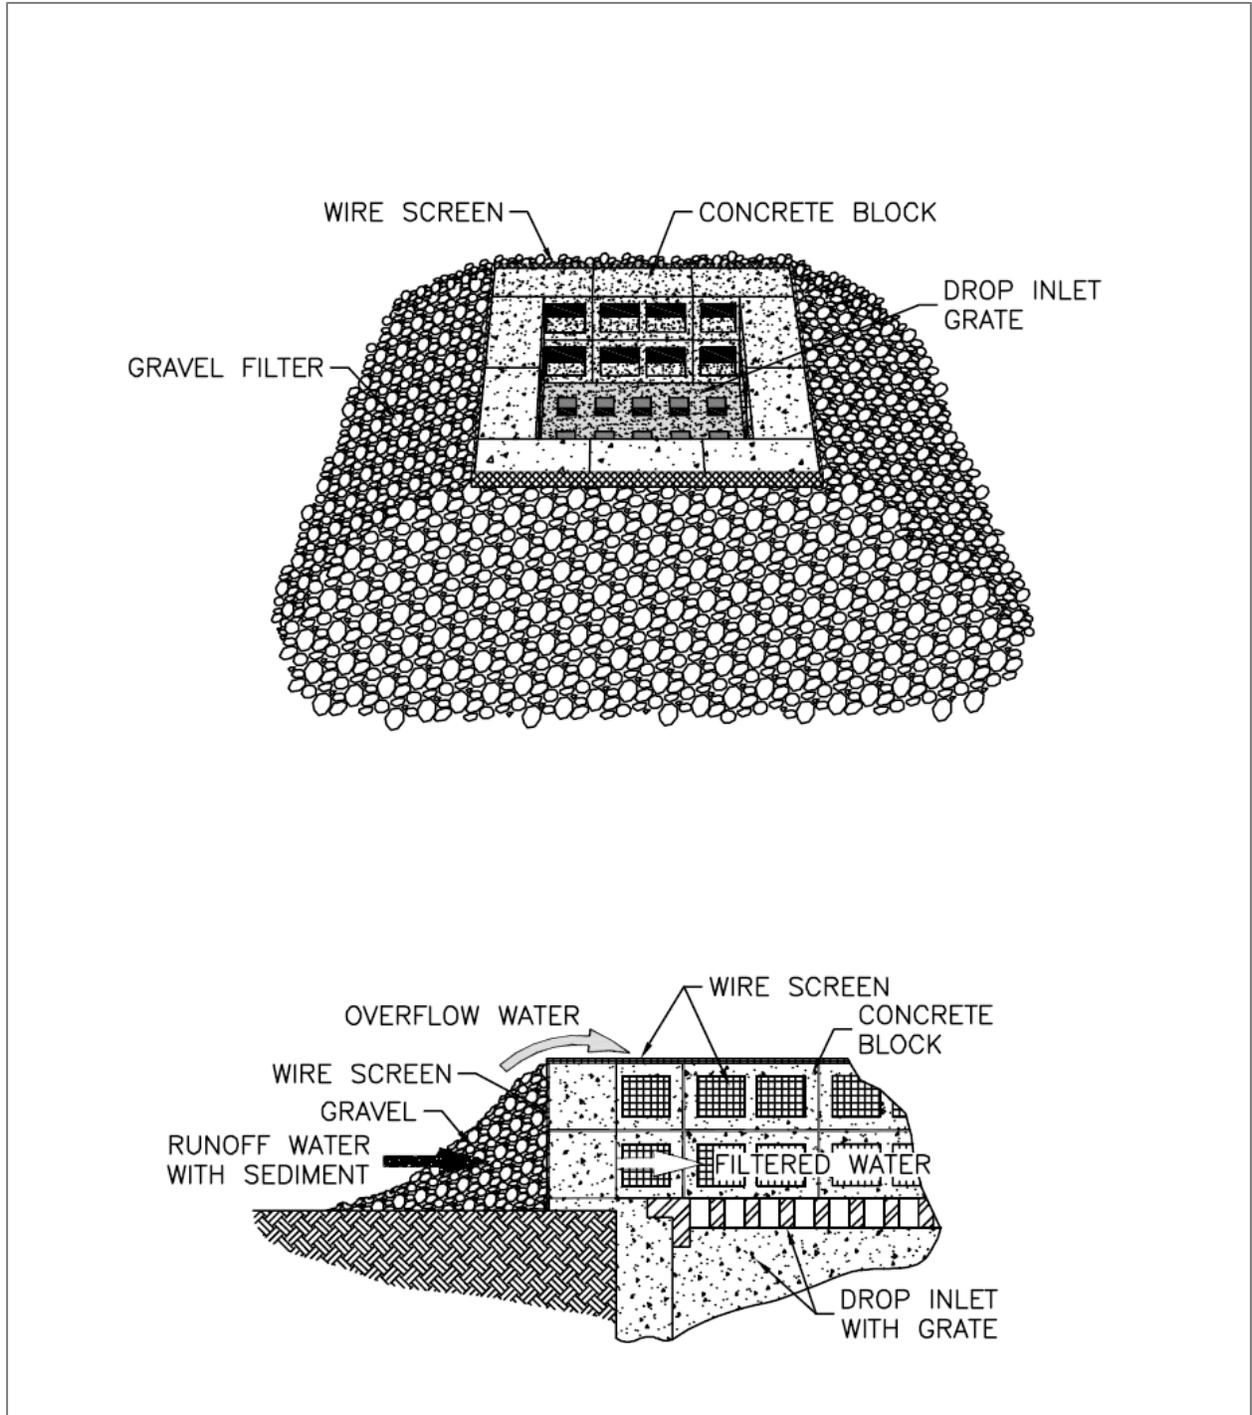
Typical Details of Block and Gravel Inlet Protection
